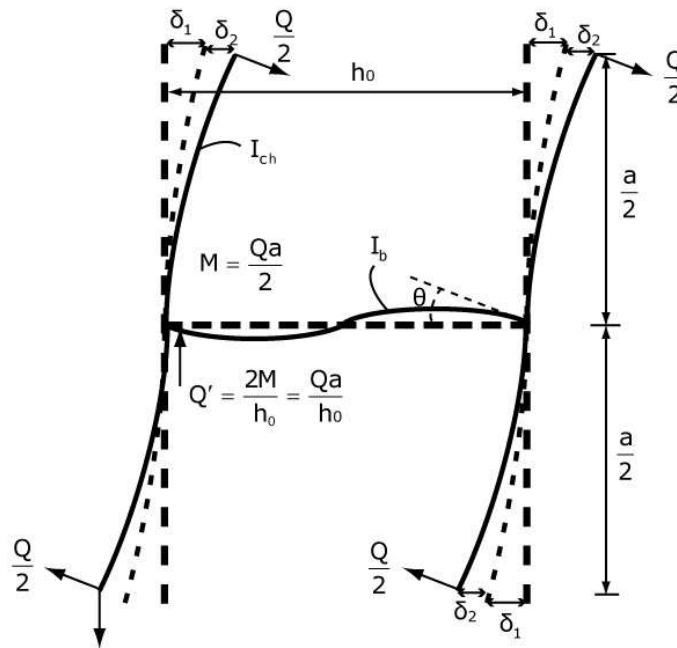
Deformed shape of battened column's part subjected to shear forces at its ends
